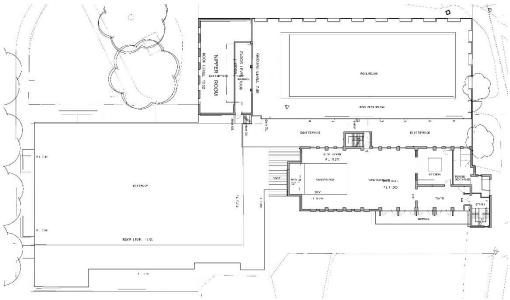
First Floor Plan (extract from plans by Bergstrom Architects 2017)
